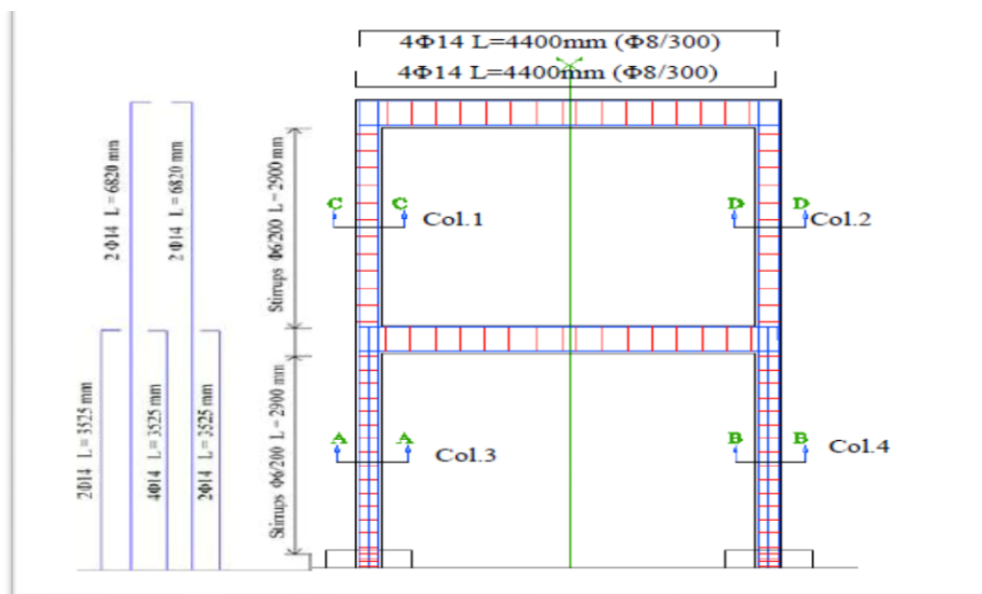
Details of Frame Reinforcement ( Chaudat et al., 2005)
